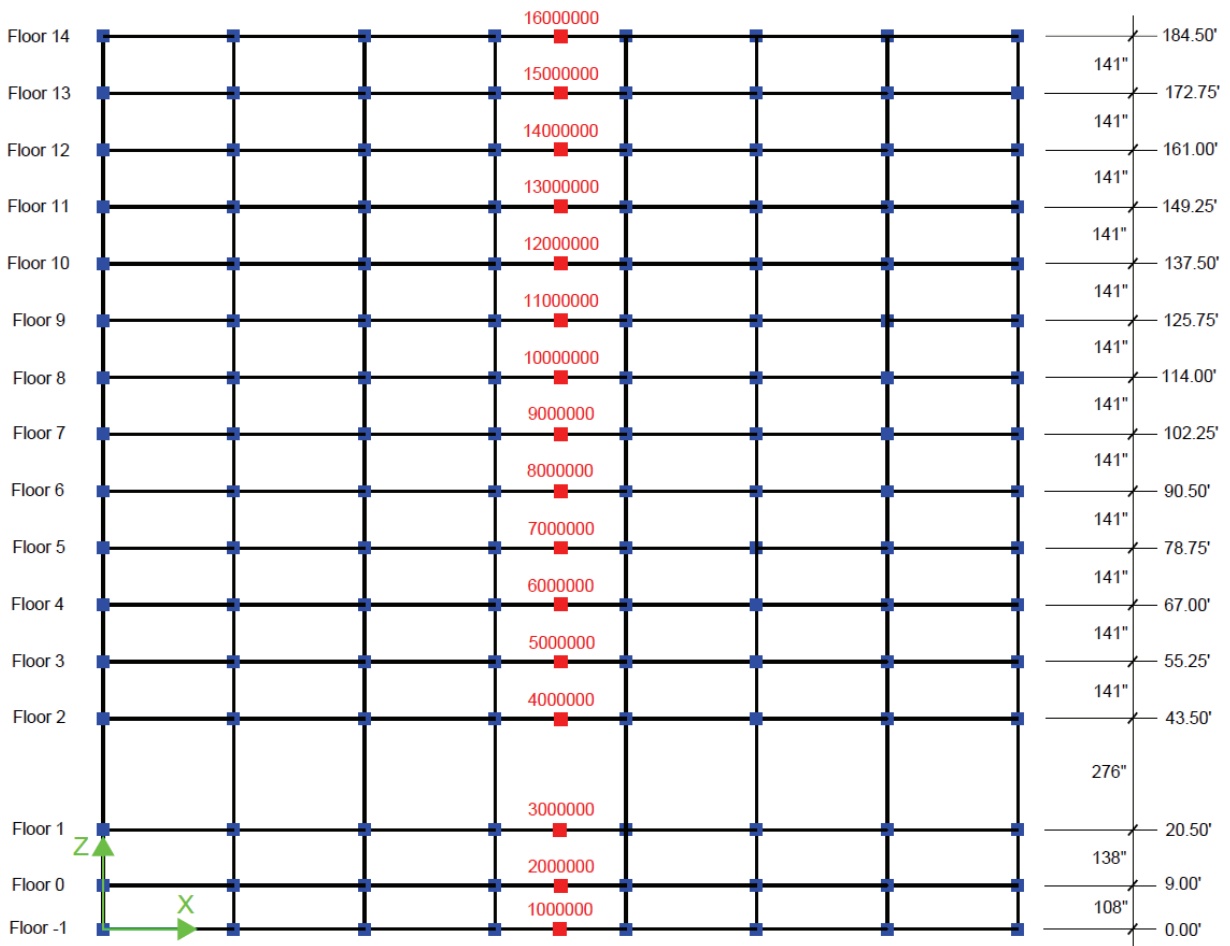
Longitudinal elevation (X-direction) of the full-building model of the Sherman Oaks building.
